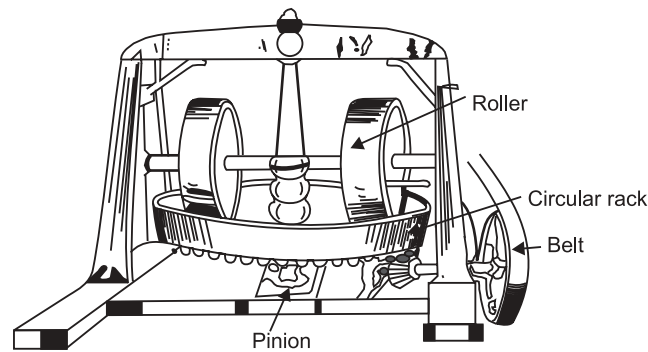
Power Driven Mortor Mill (Pan Mill)
